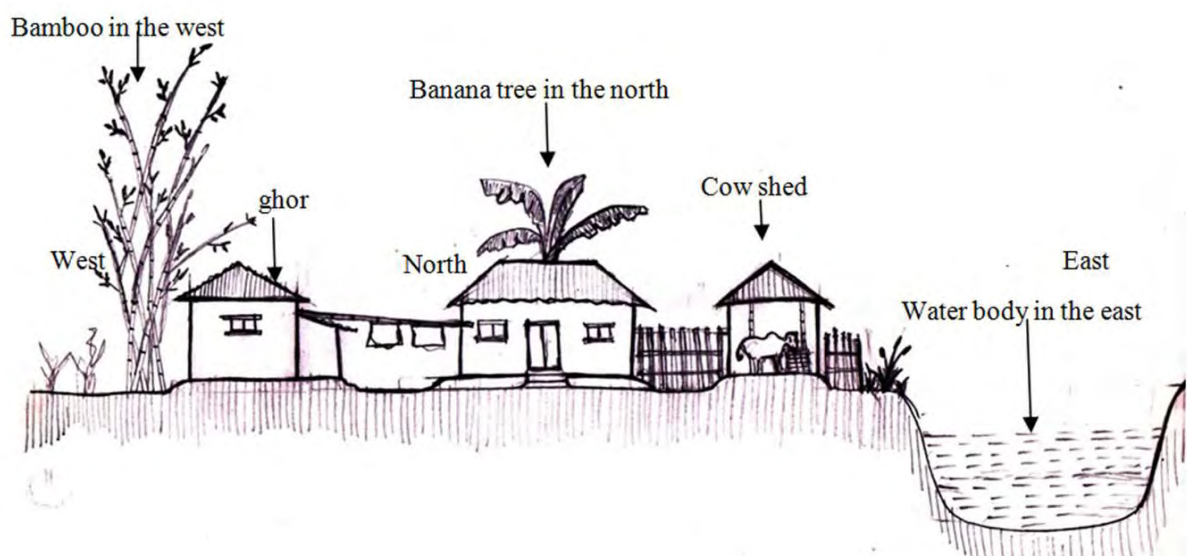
Section of a rural homestead. The section shows a complete site planning according to the maxim of Khona
